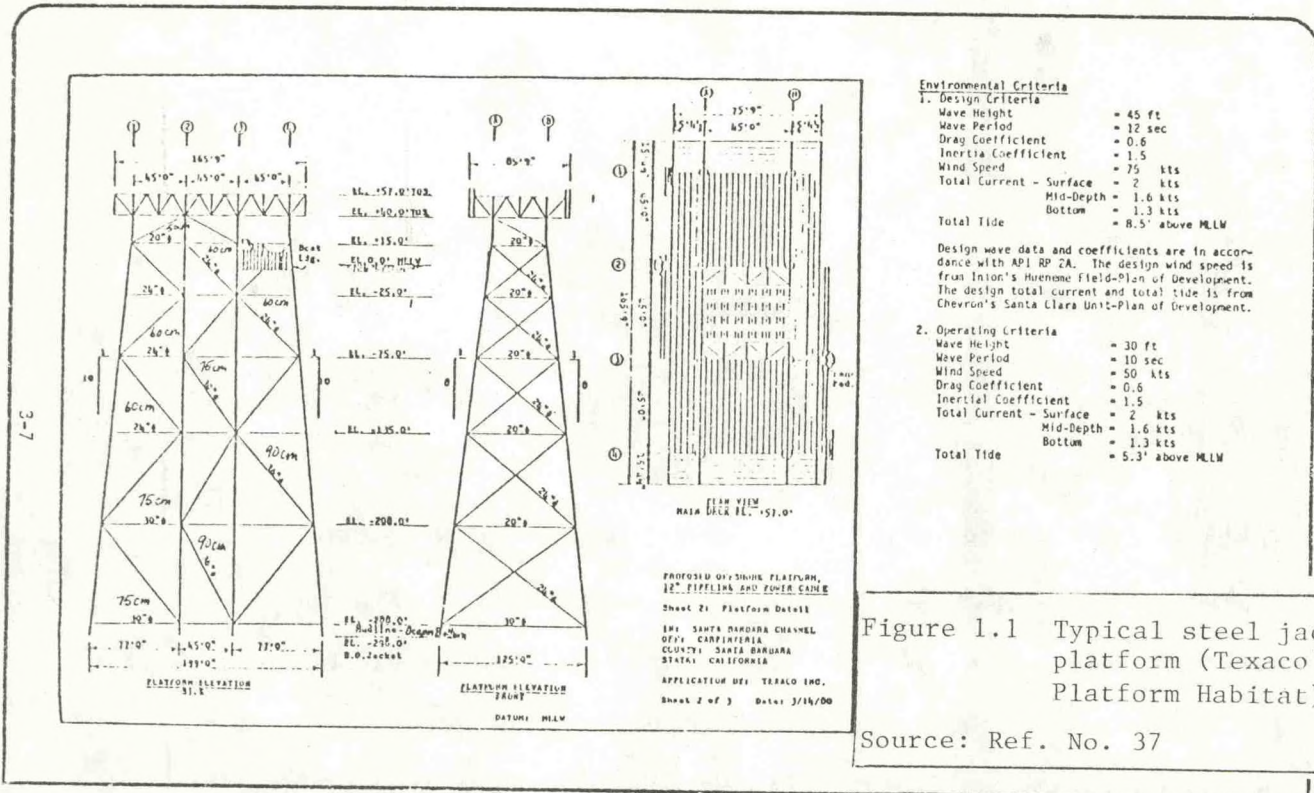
Typical steel jacket platform (Texaco's Platform Habitat)
